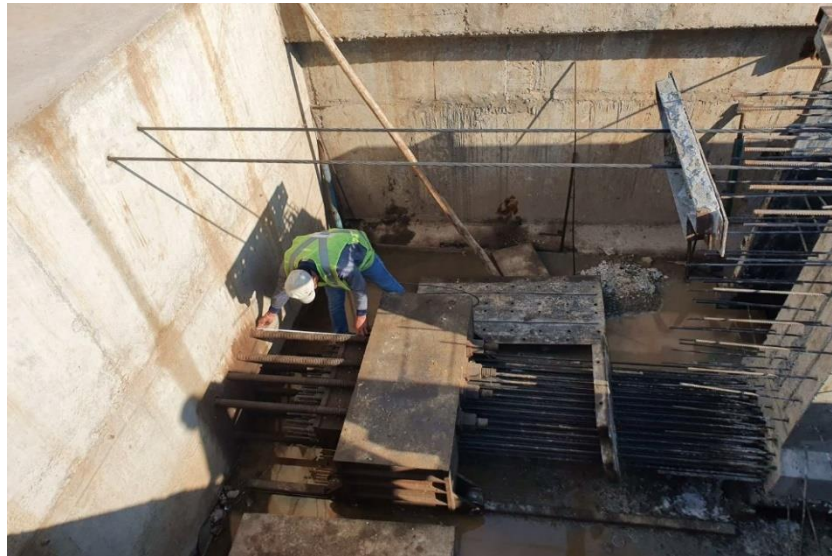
6 Anchor Block Wall for pretensioned Girder
